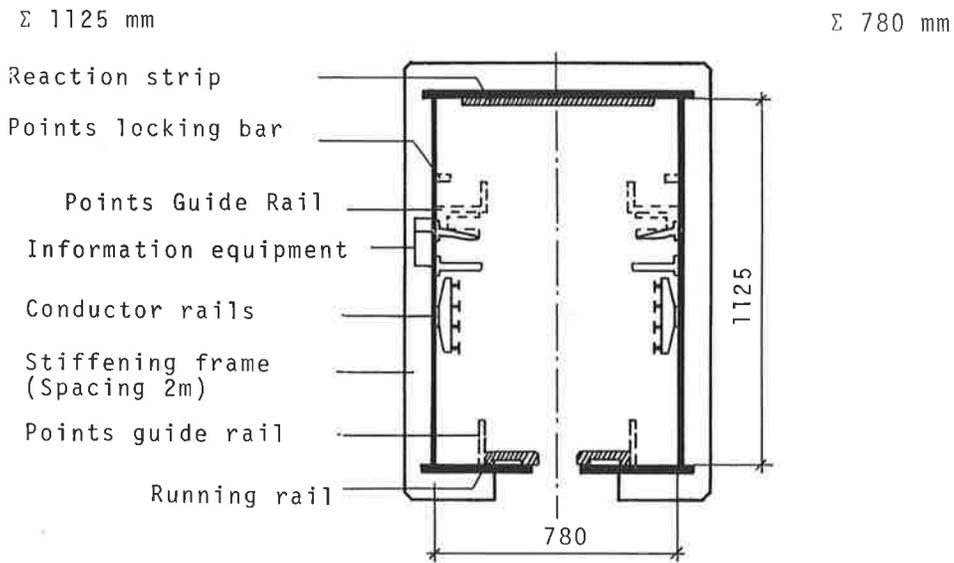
TRACK BEAM DETAILS (CONTINUED)
